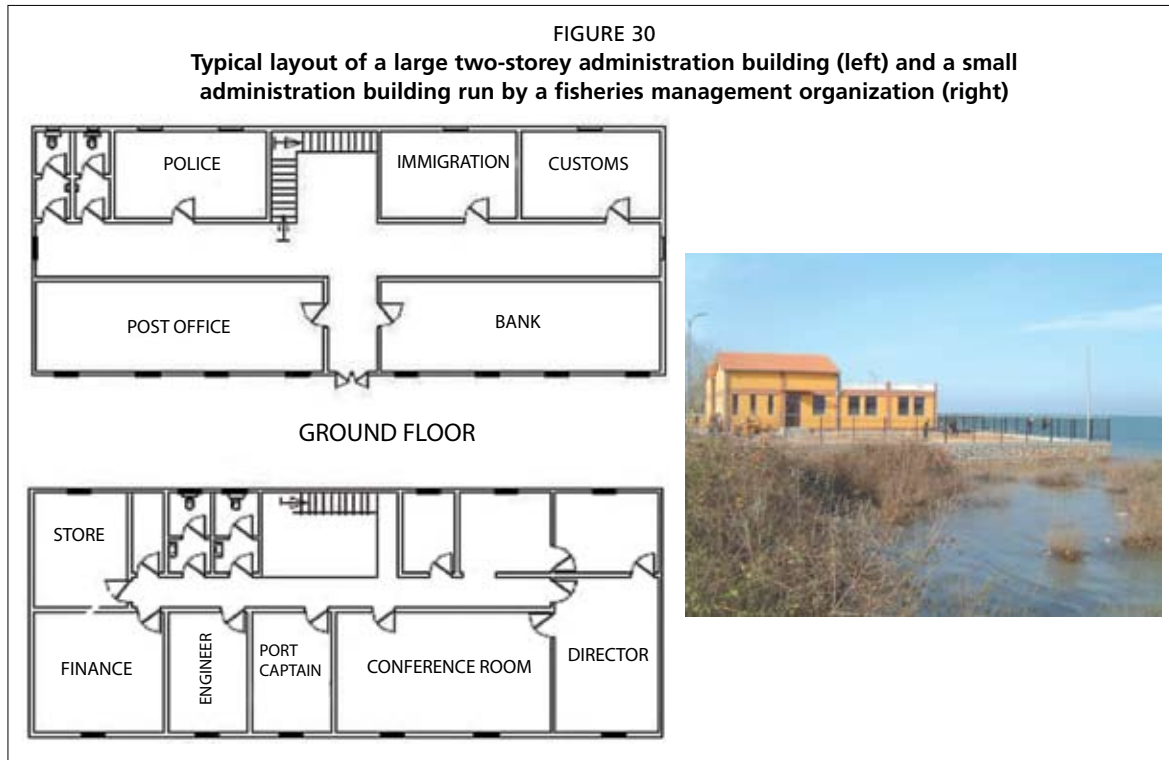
illustrates a typical ground-floor plan for a two-storey building suitable for port administration. The top floor should be reserved for the management staff, whereas the ground floor should include all types of interface services, such as police, customs and immigration, if required, and bank or post office. Office space destined for the installation of MCS radar screens should have adequate air-conditioning facilities.
